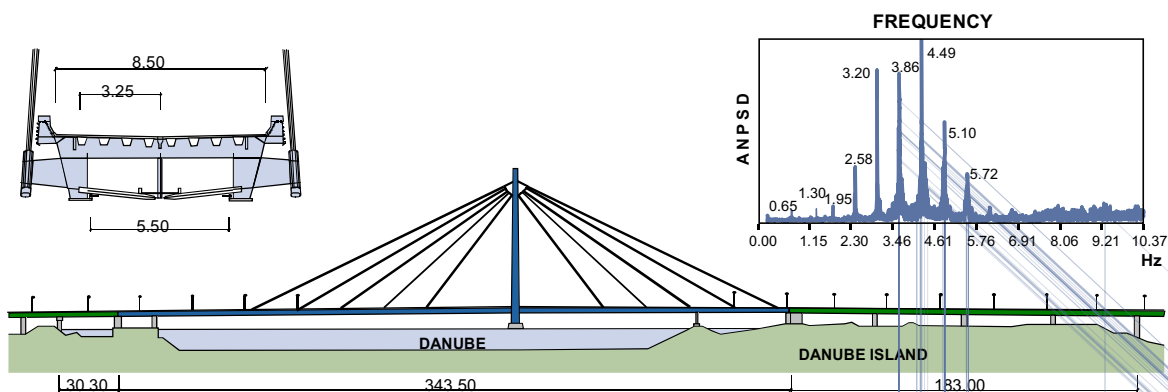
Elevation, cross section and spectrum of cable 10 N
